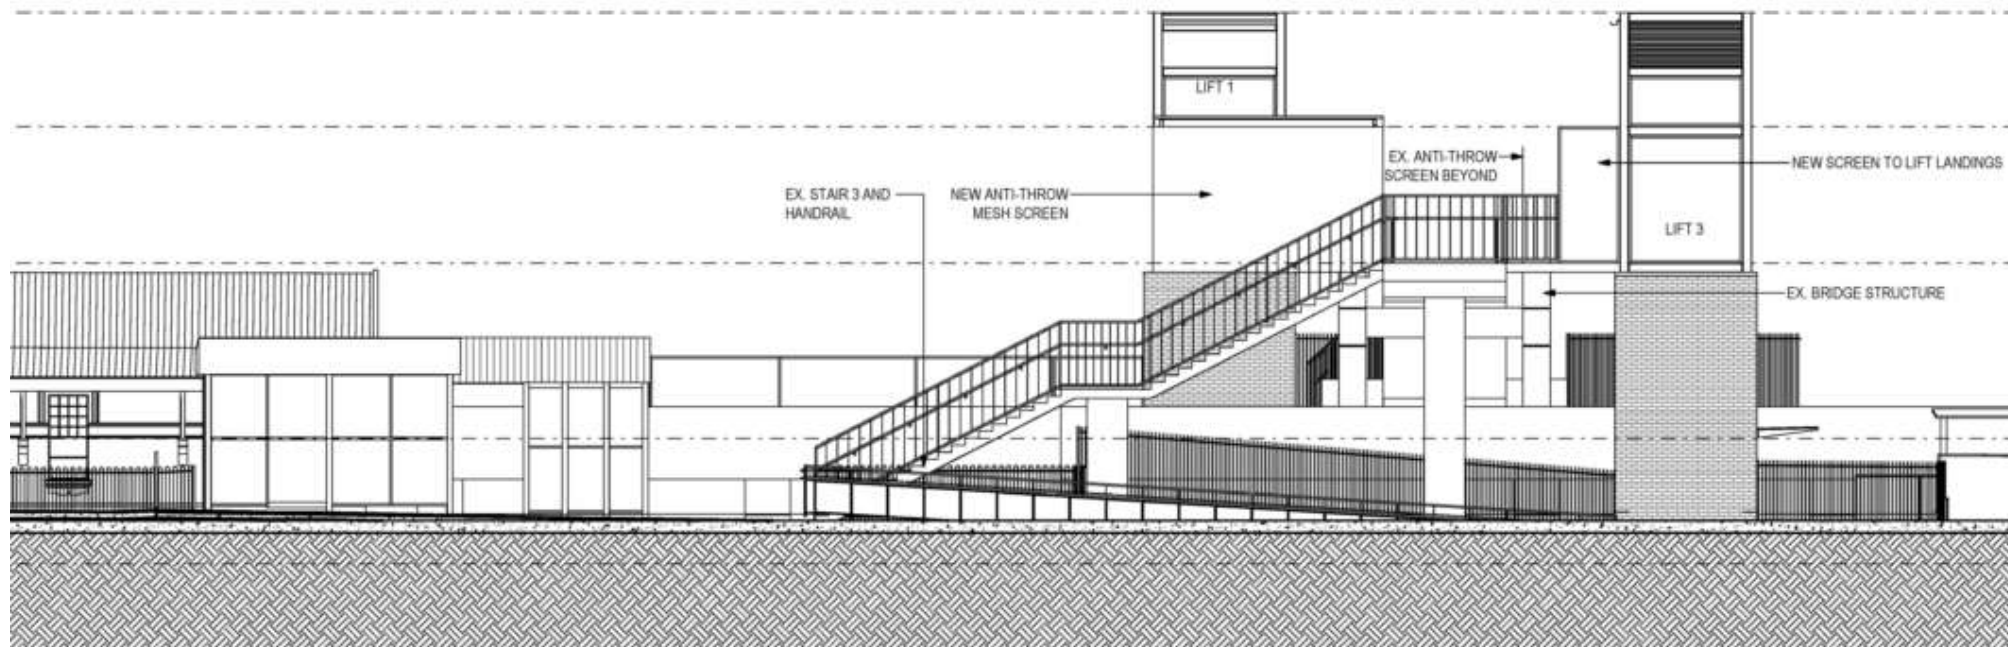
Elevation – view eastwards from Hamilton Street entry (Source: Transport for NSW)
